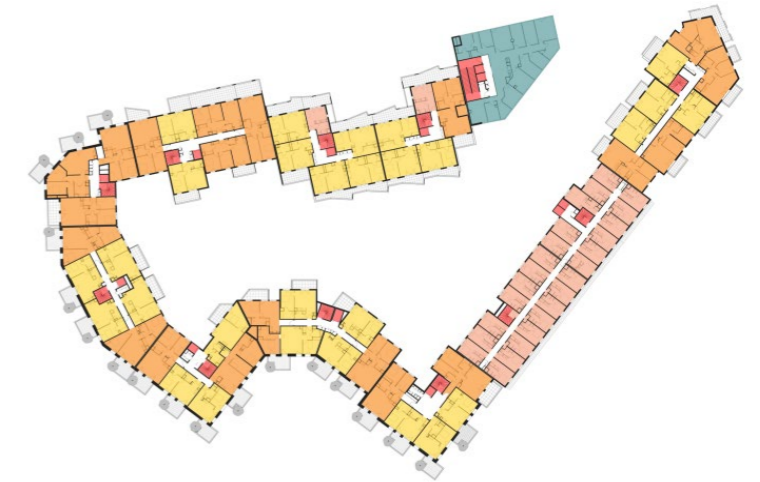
Typical floor plan/ source: ArchDaily.com edited by the author
